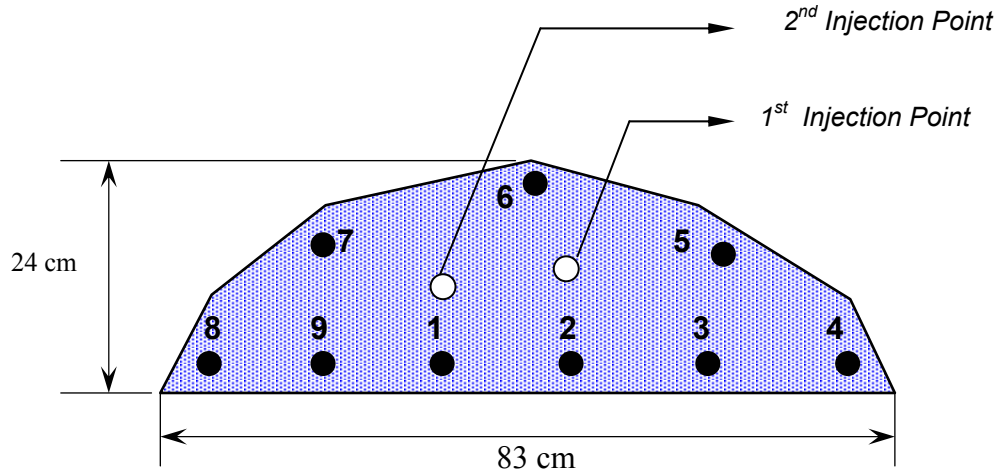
Outlet Layout (1 in. =2.54 cm)
